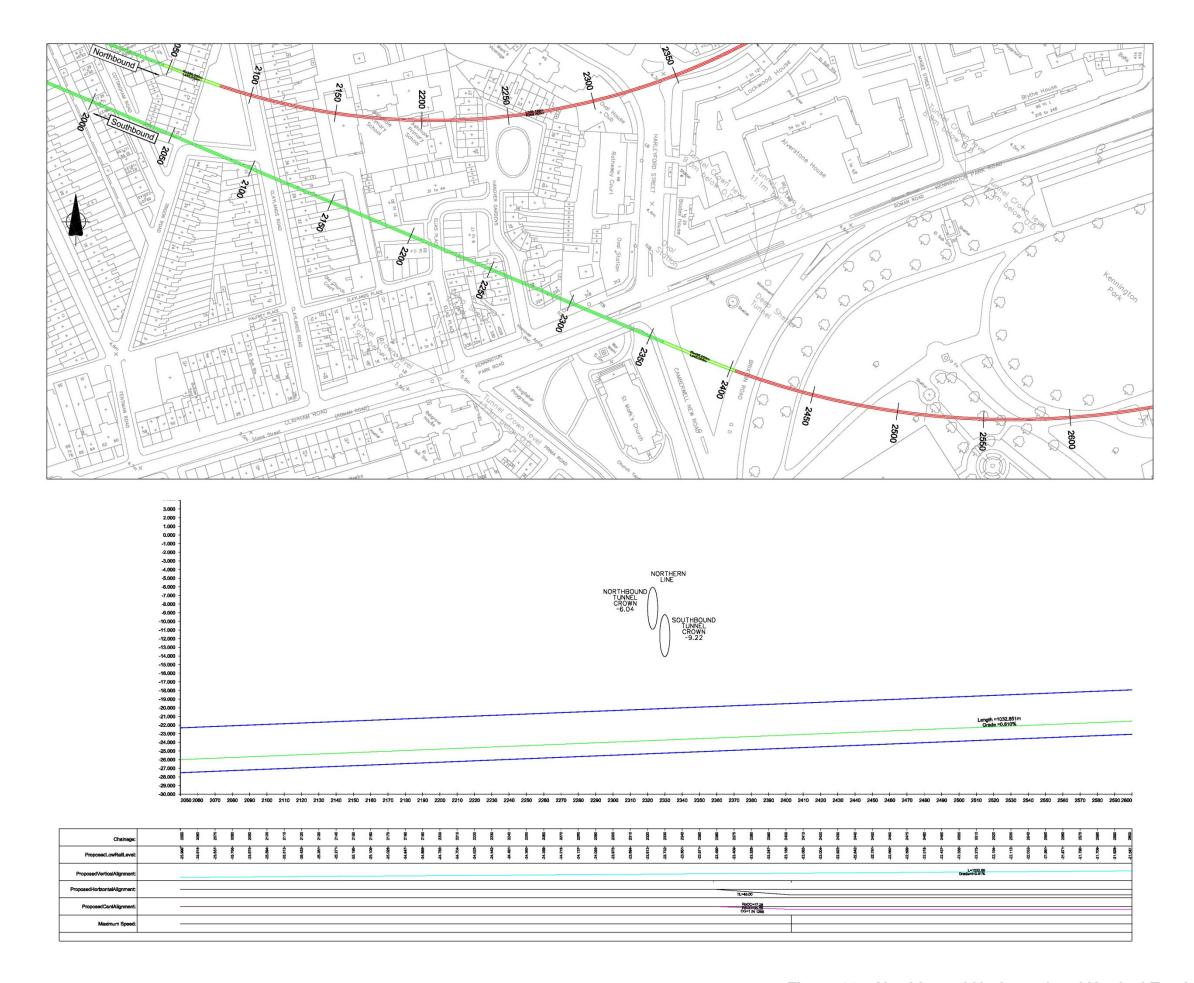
Northbound Horizontal and Vertical Track Alignment Sheet 11
